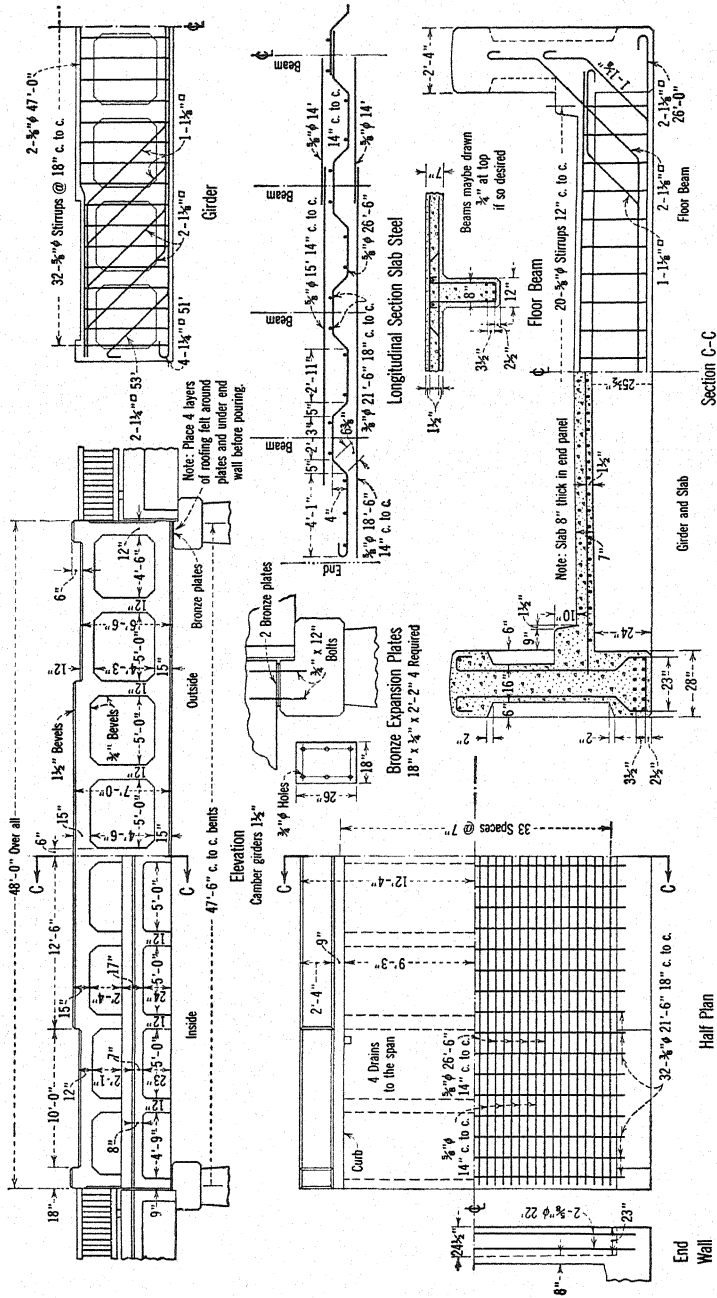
Through Girder Span. Savannah Delta Trestle. (See p. 117.)
